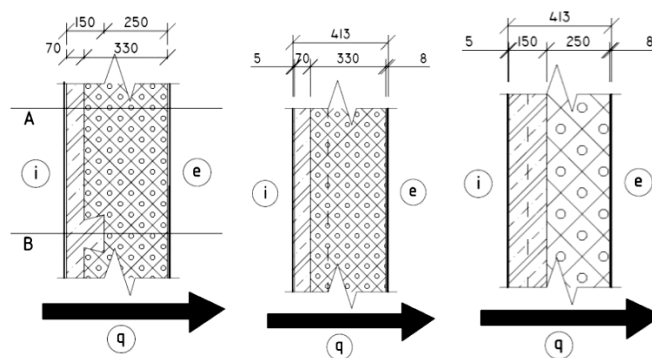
Wall layout view and schemes of cut A and B of external wall
